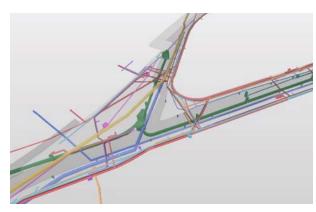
As-built pipes and cables at the Högerdamm urban street (source: LSBG/LGV)
